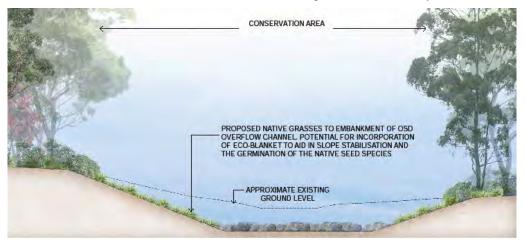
Indicative cross-section of the proposed basin outlets (adapted from GroundInk 2016)
